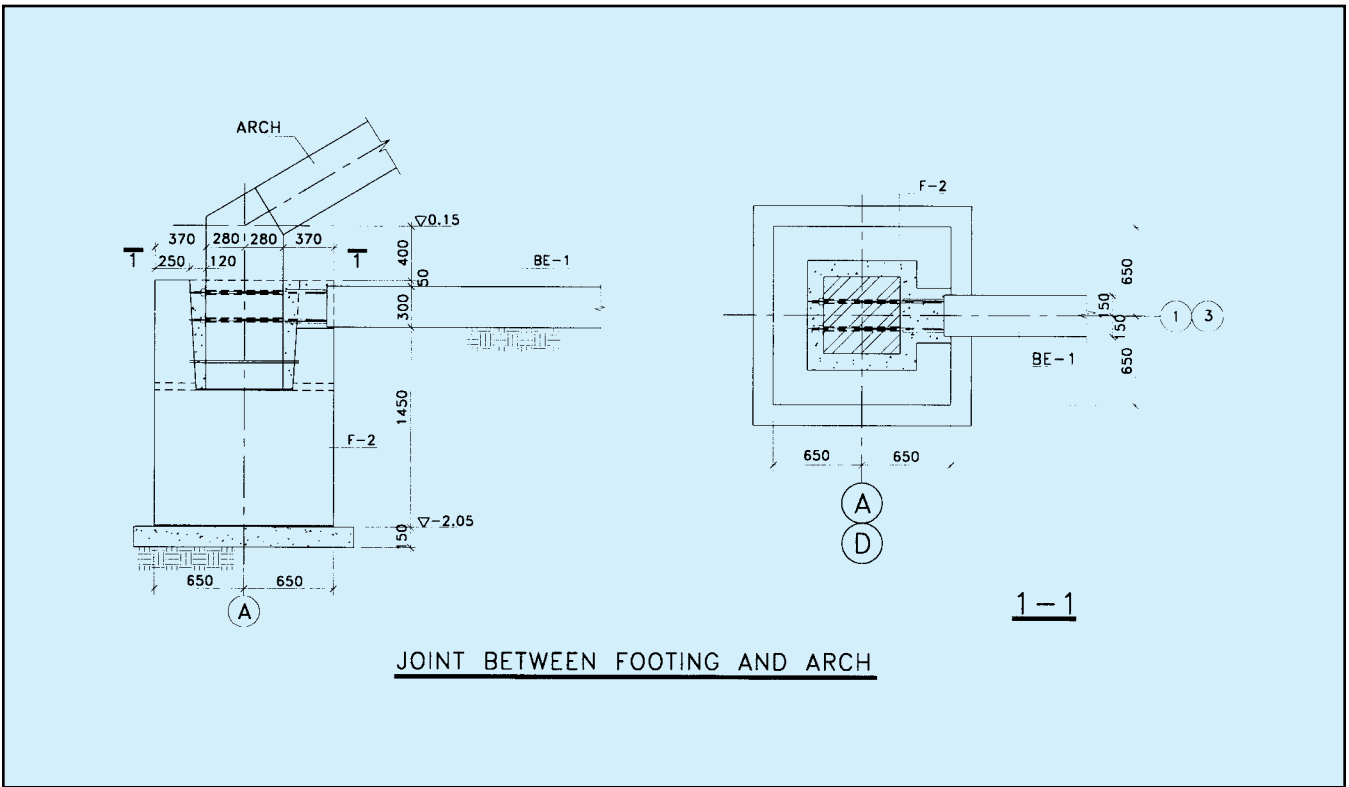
Connection detail of upper chord element of arch, tension, footing beam and pocket foundation.
